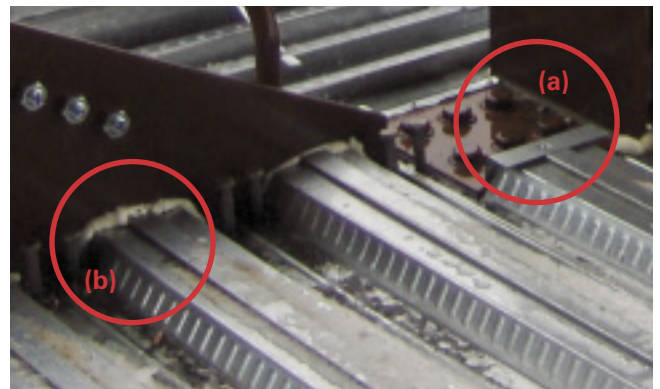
Steel Decking sheets with a) end closure plates and b) filler foam
